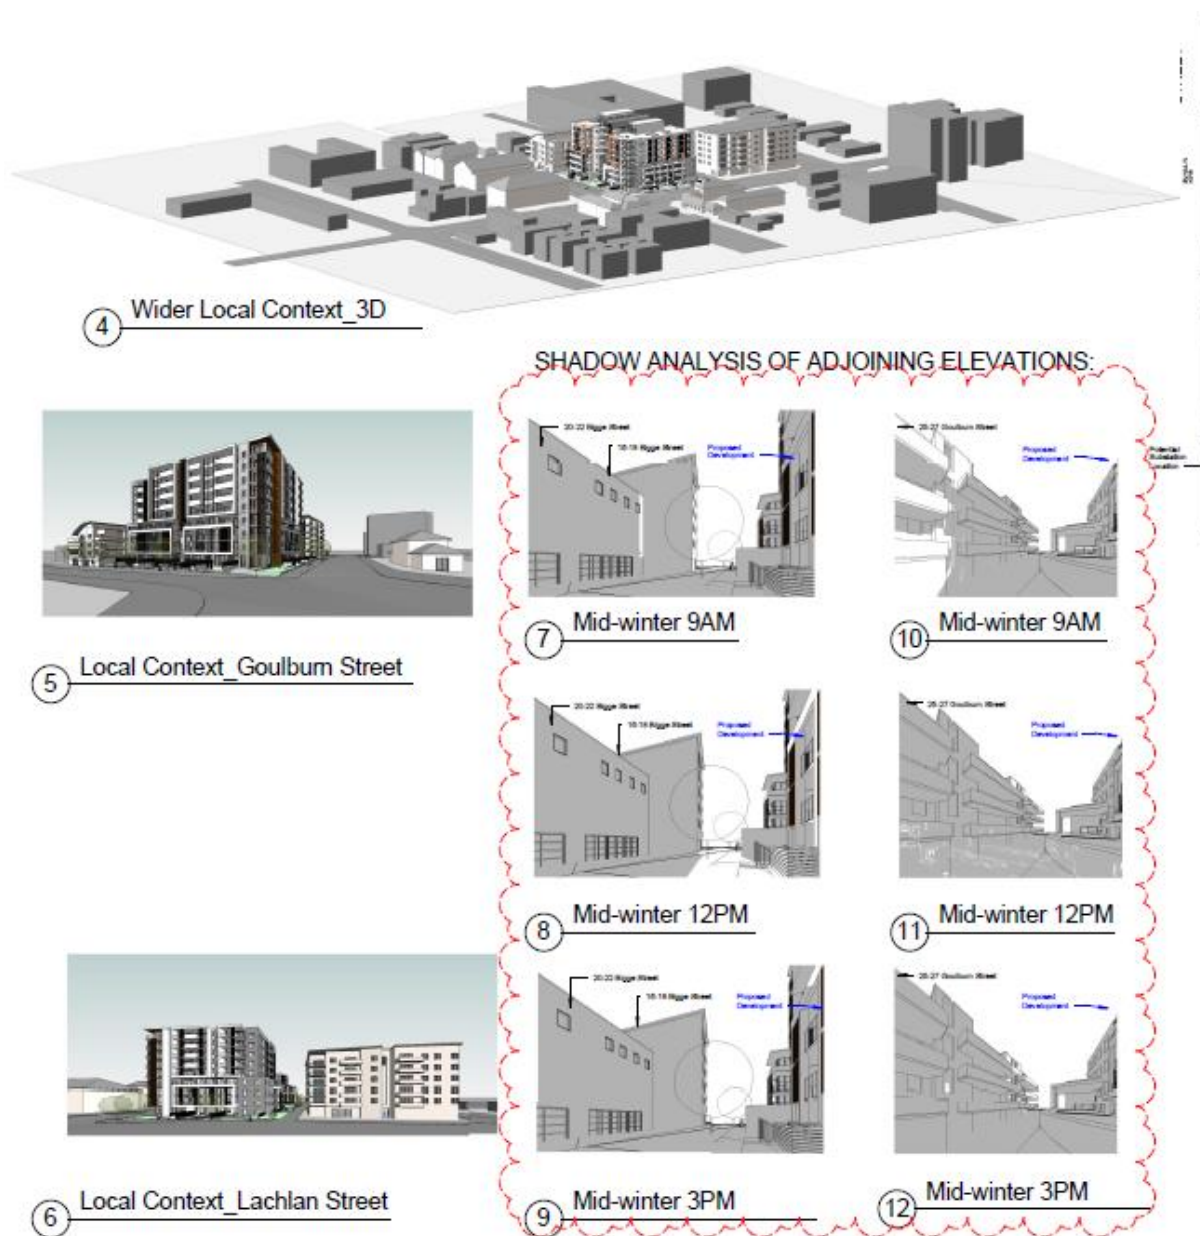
View of shadows cast by the amended proposal demonstrating that shadow impact upon the southern adjoining residential flat building is marginally improved at 12noon and 3pm at mid-winter.
